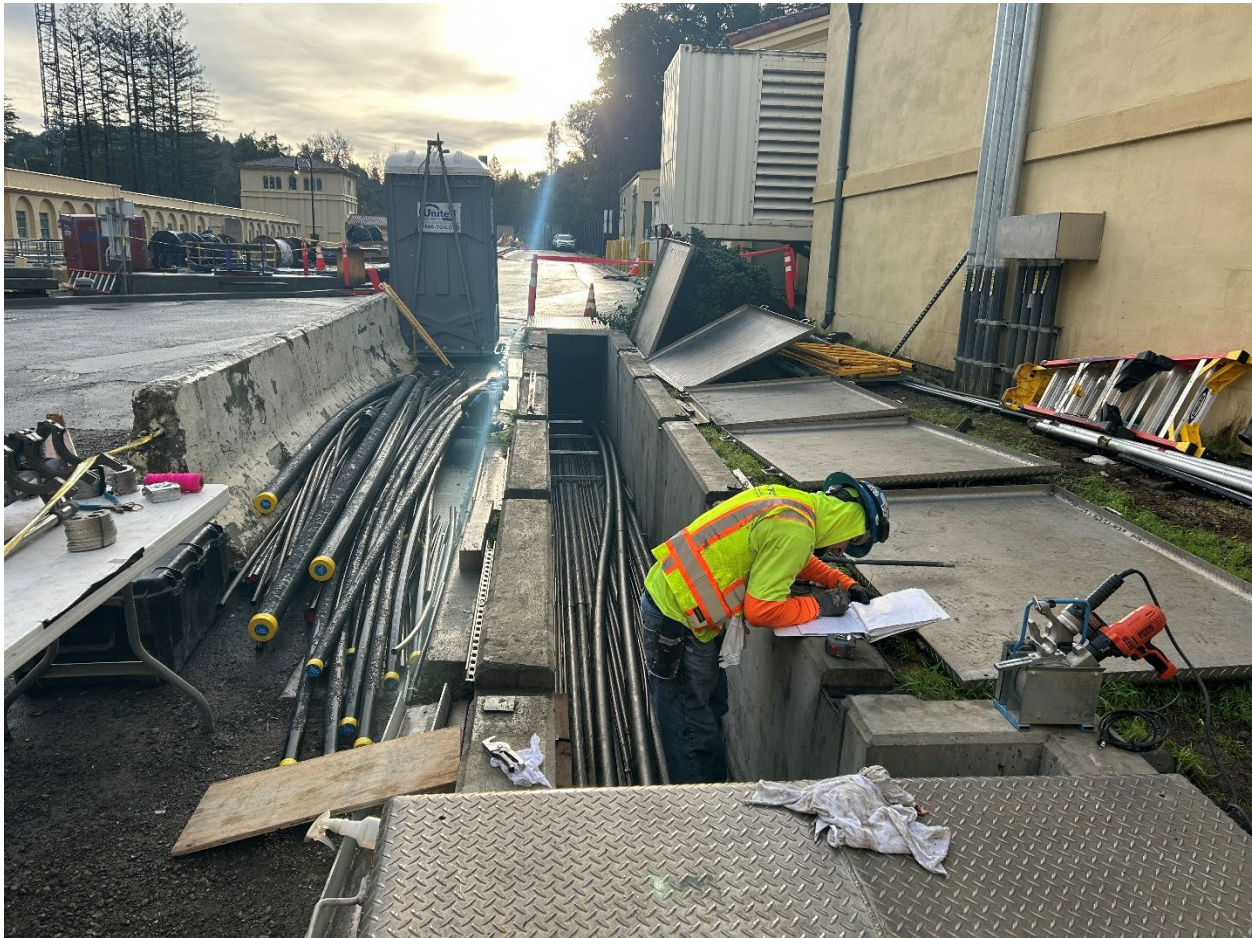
Worker installing high density polyurethane chemical piping in a pipe trench.
